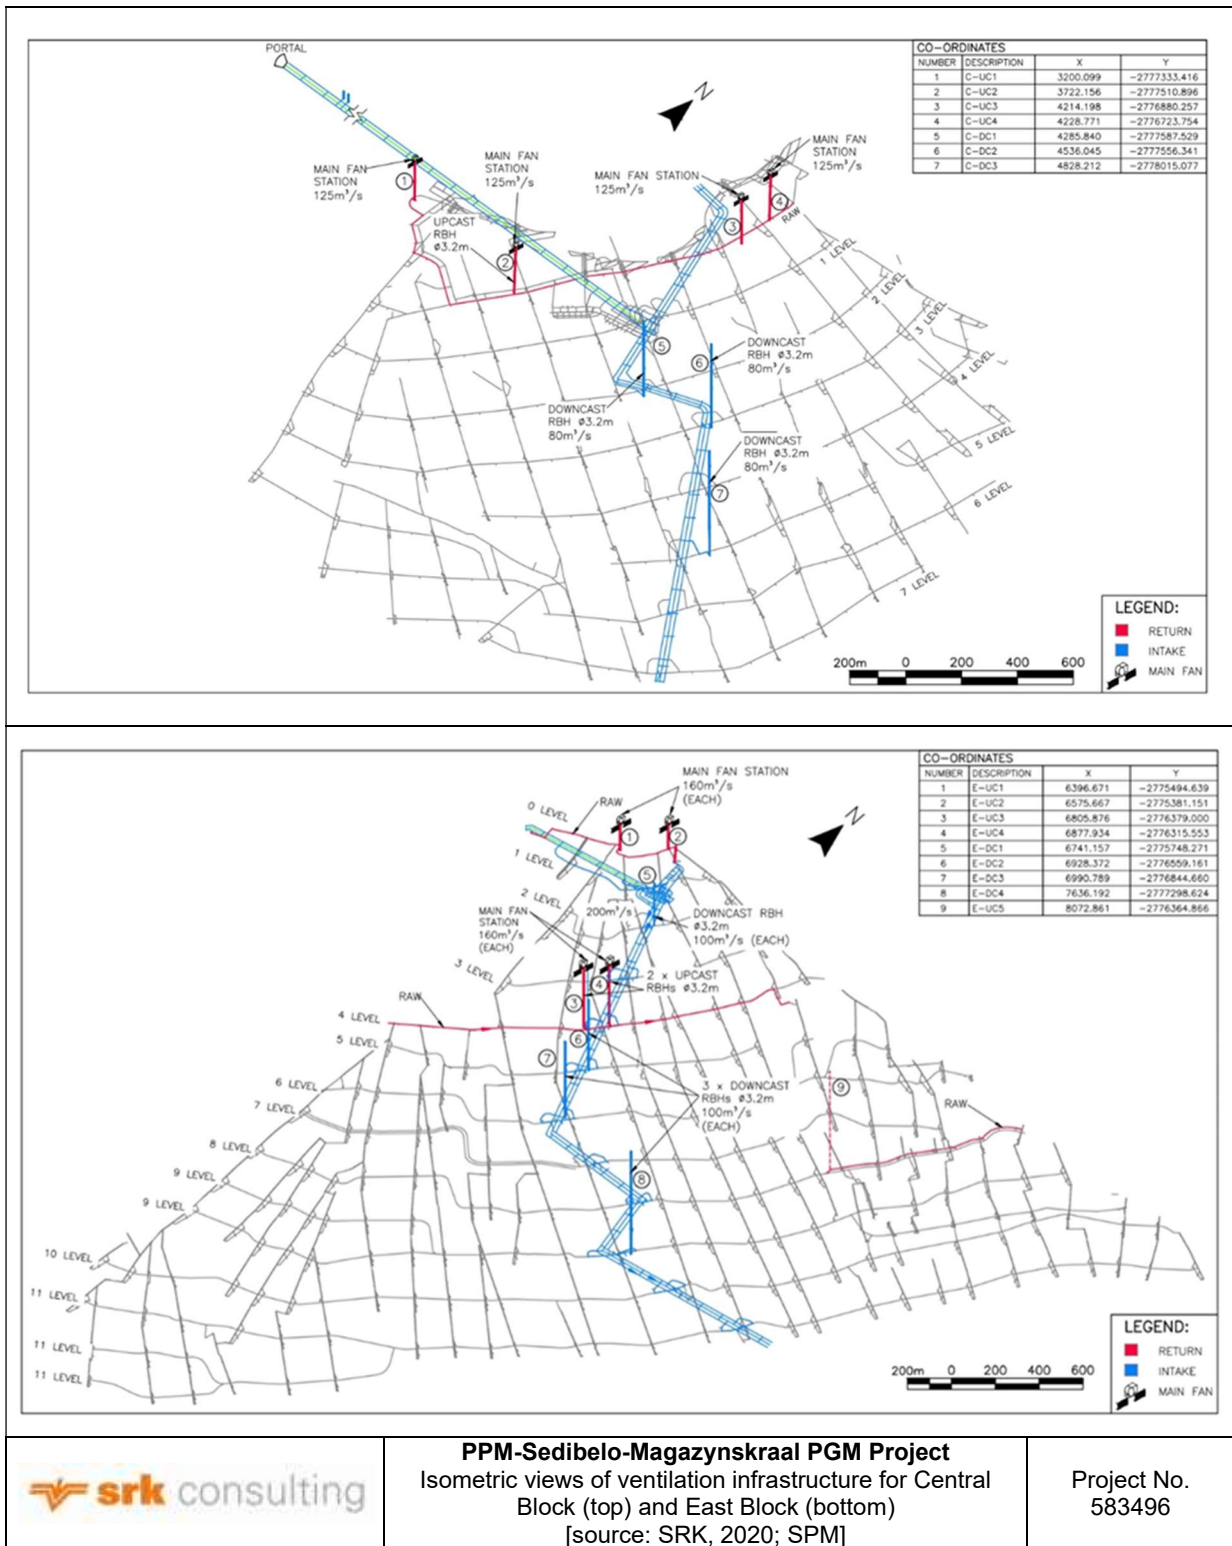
Isometric views of ventilation infrastructure for Central Block (left) and East Block (right)
